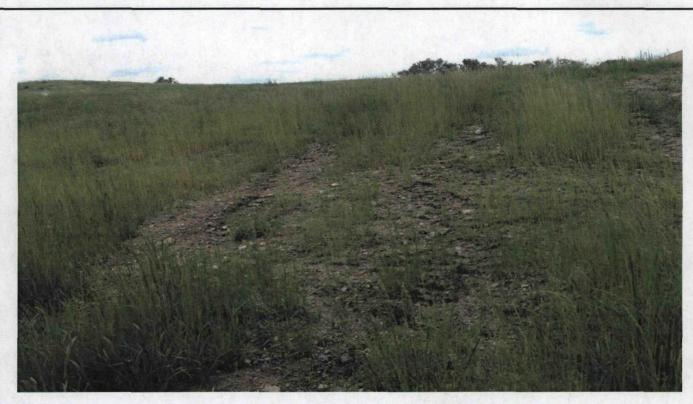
Photo shows erosion on the slope above the rip rap at the outlet of the south pore water discharge pipe.
